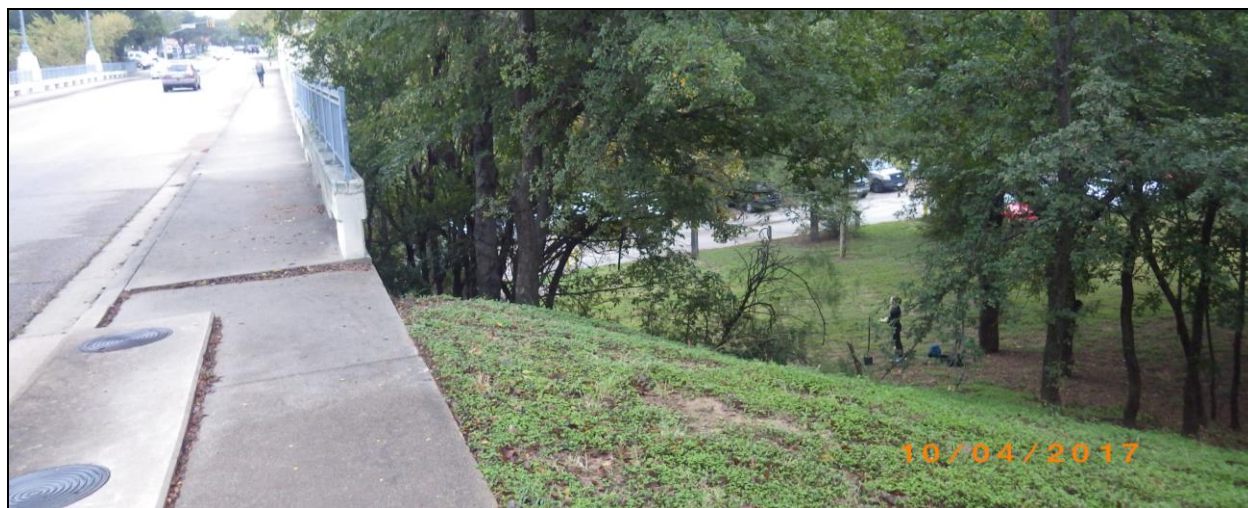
Looking towards ST1 and the Park Hill Bridge from sidewalk along Park Hill Dr.
